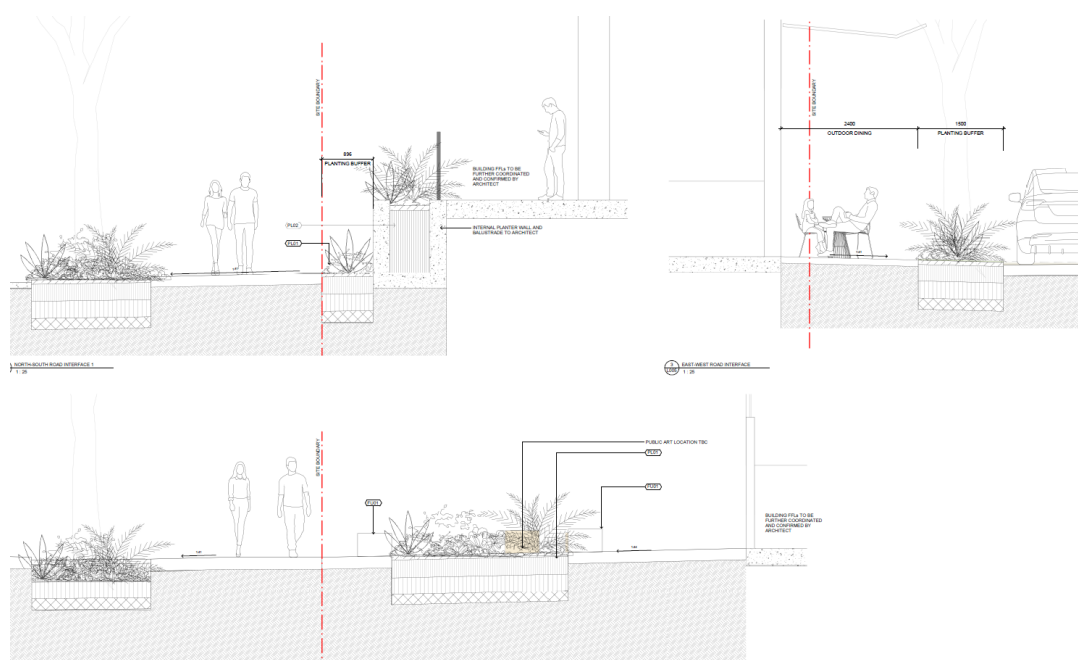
Landscape sections – Ground Floor (Source: Oculus)
